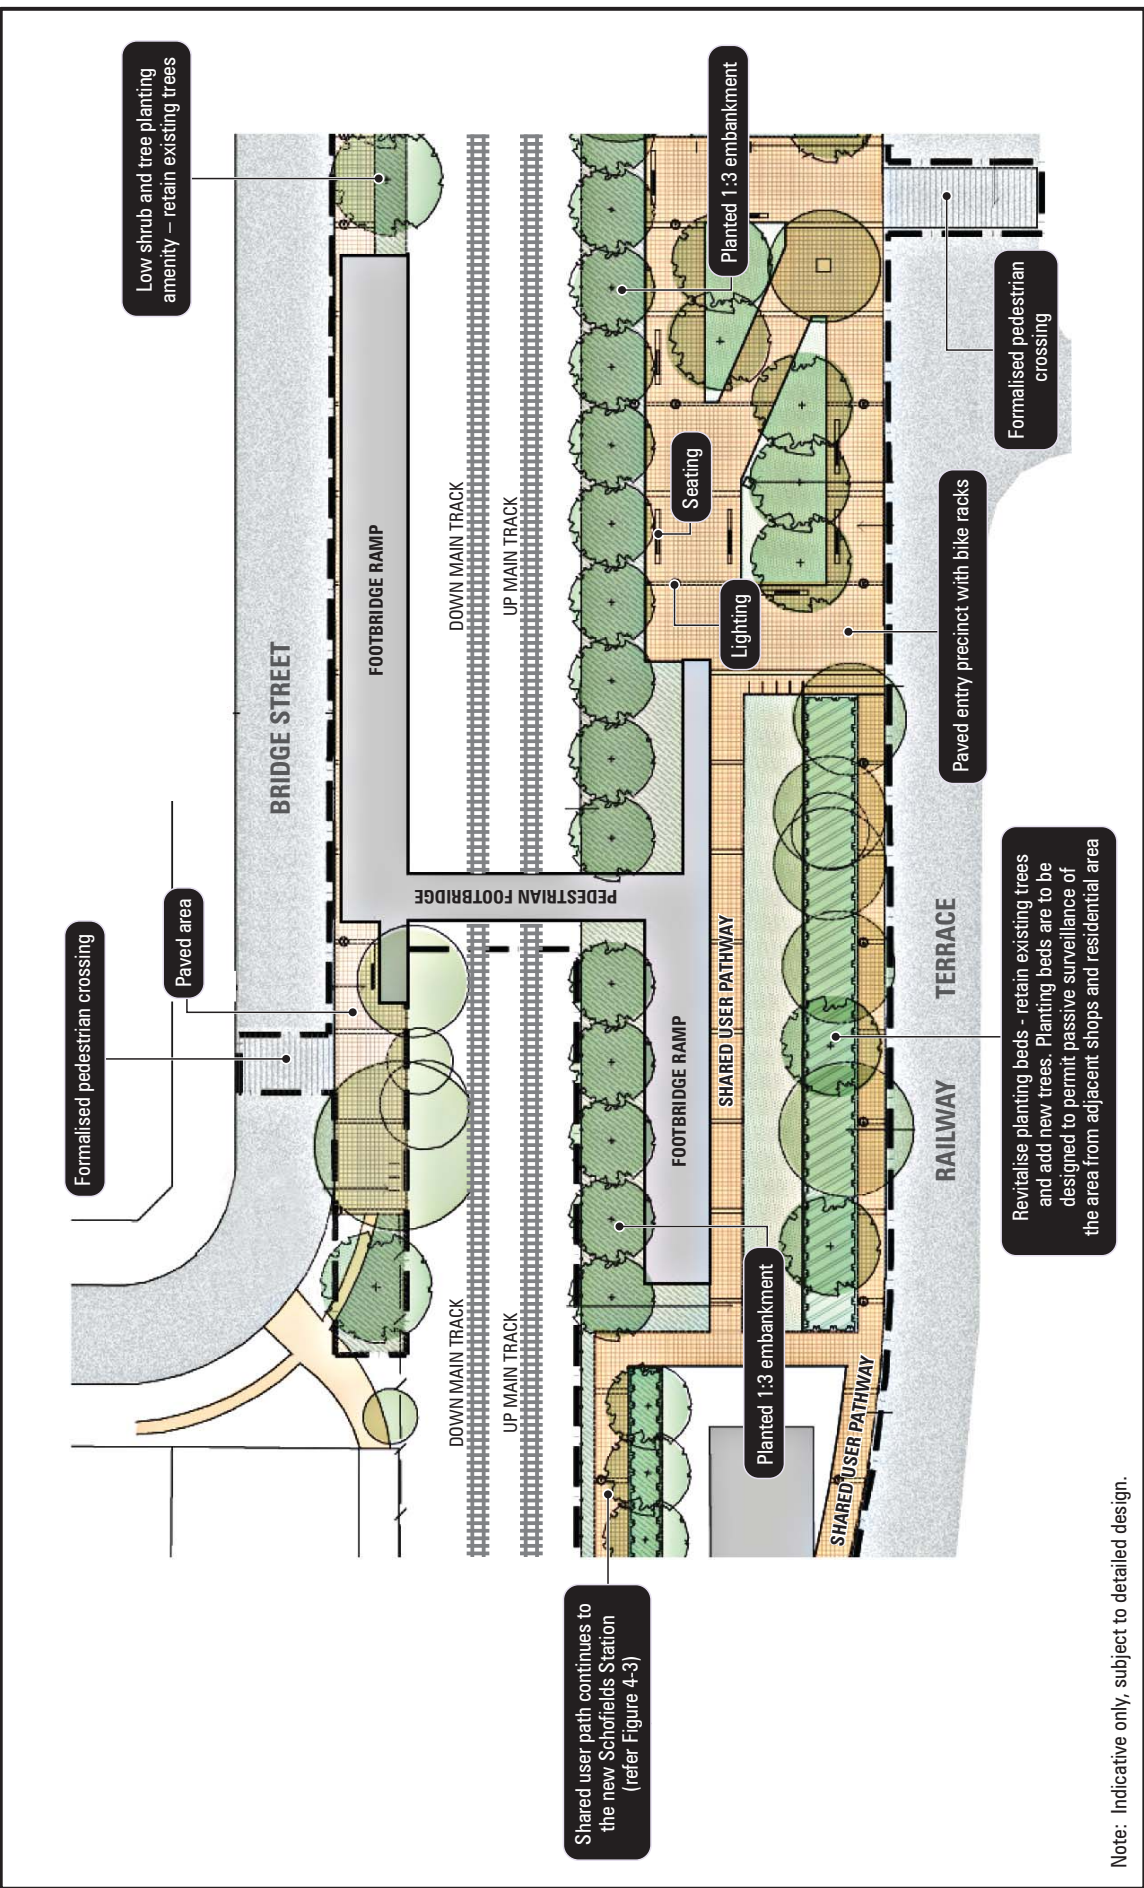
Indicative landscaping plan for Schofields pedestrian footbridge
